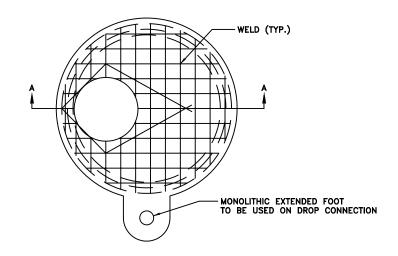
DETAIL: SHALLOW PRECAST SEWER MANHOLE NO SCALE
